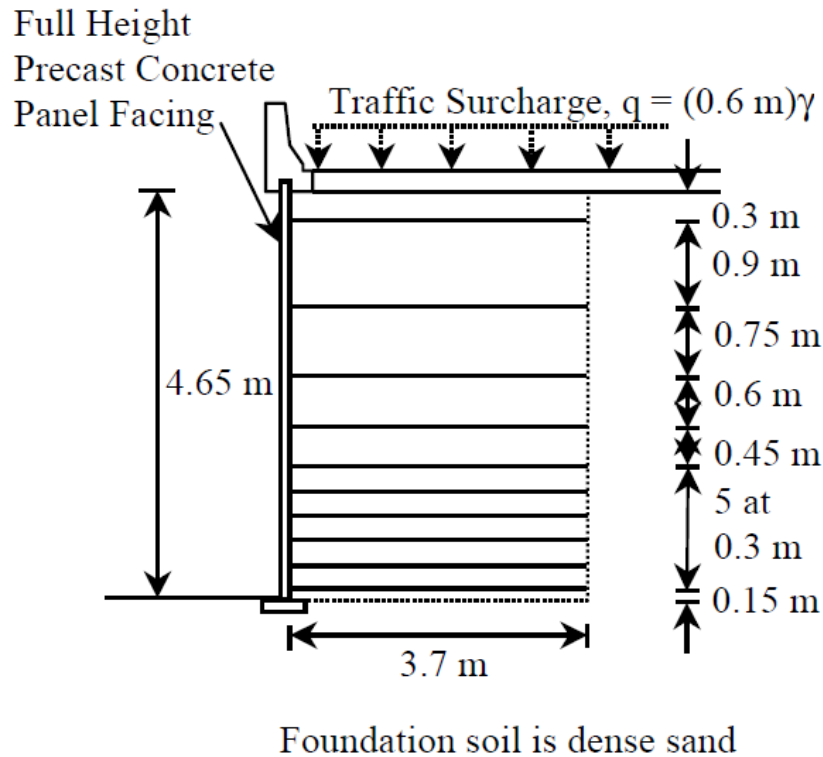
Cross-section for the precast concrete, geogrid reinforced MSE wall in Tucson, Arizona (Allen et al. 2001).
